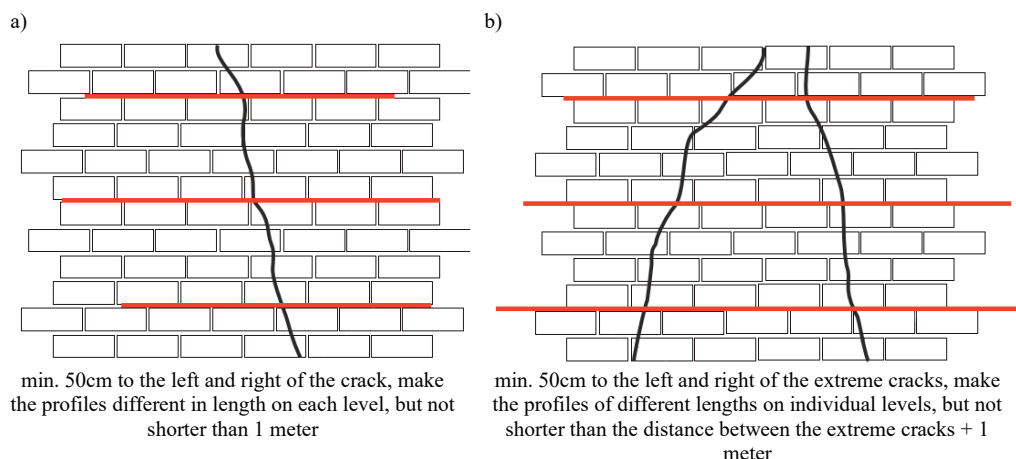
Selection of the minimum lengths of Saver profiles depending on the crack structure of the wall:
